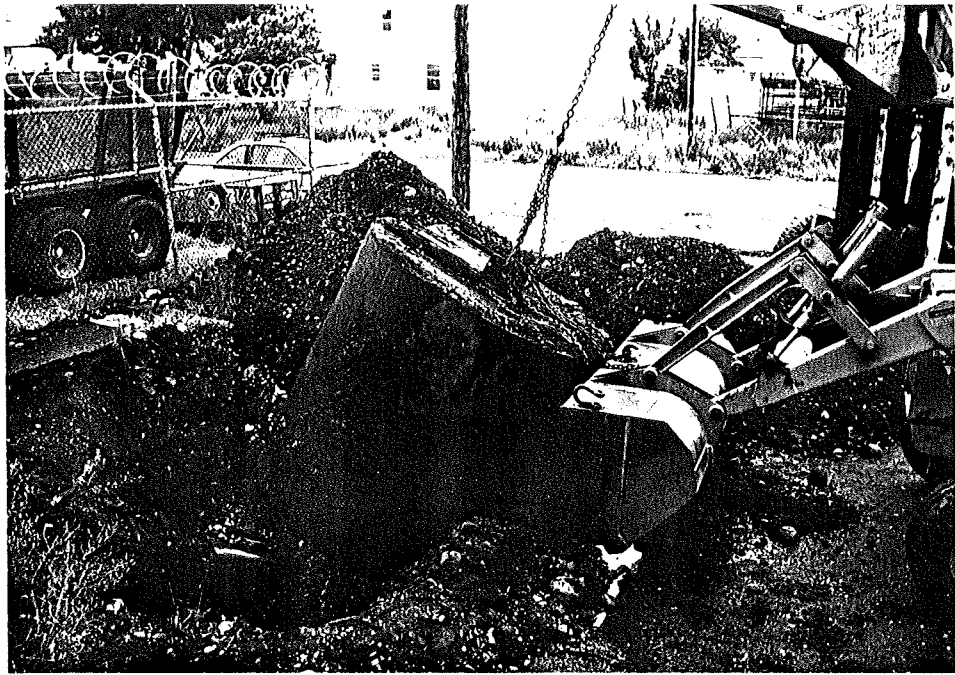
Excavating the UST. Note the broken water pipe in the lower right corner of the picture, Looking southwest.
